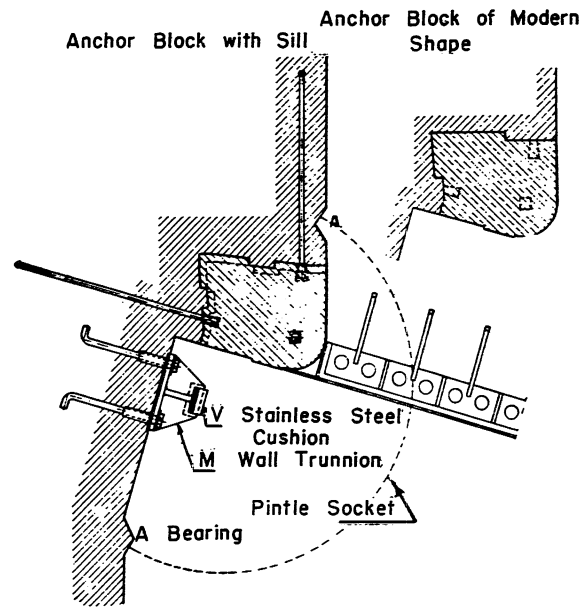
Horizontal Section Through an Anchor Block of a Miter Gate
